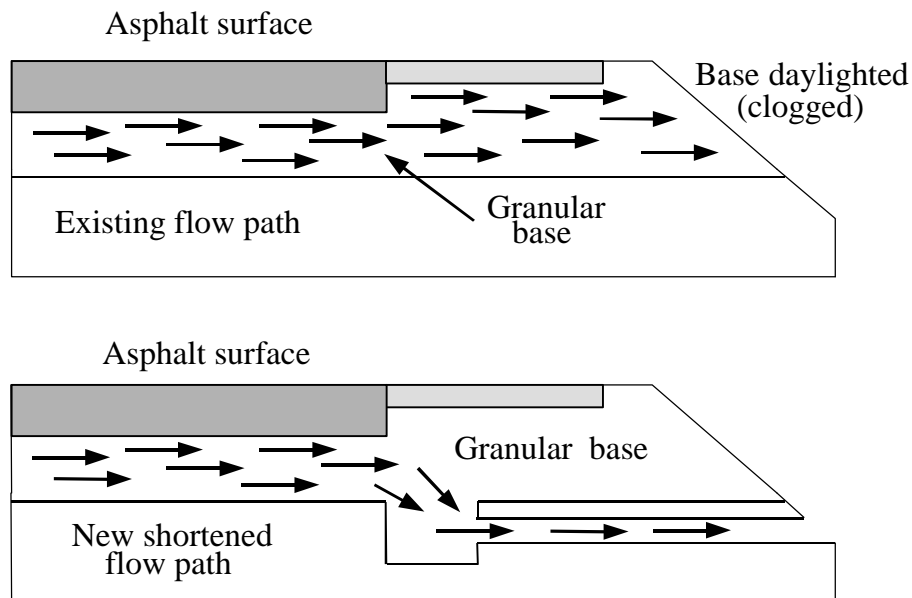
Longitudinal drain added to shorten flow path.
